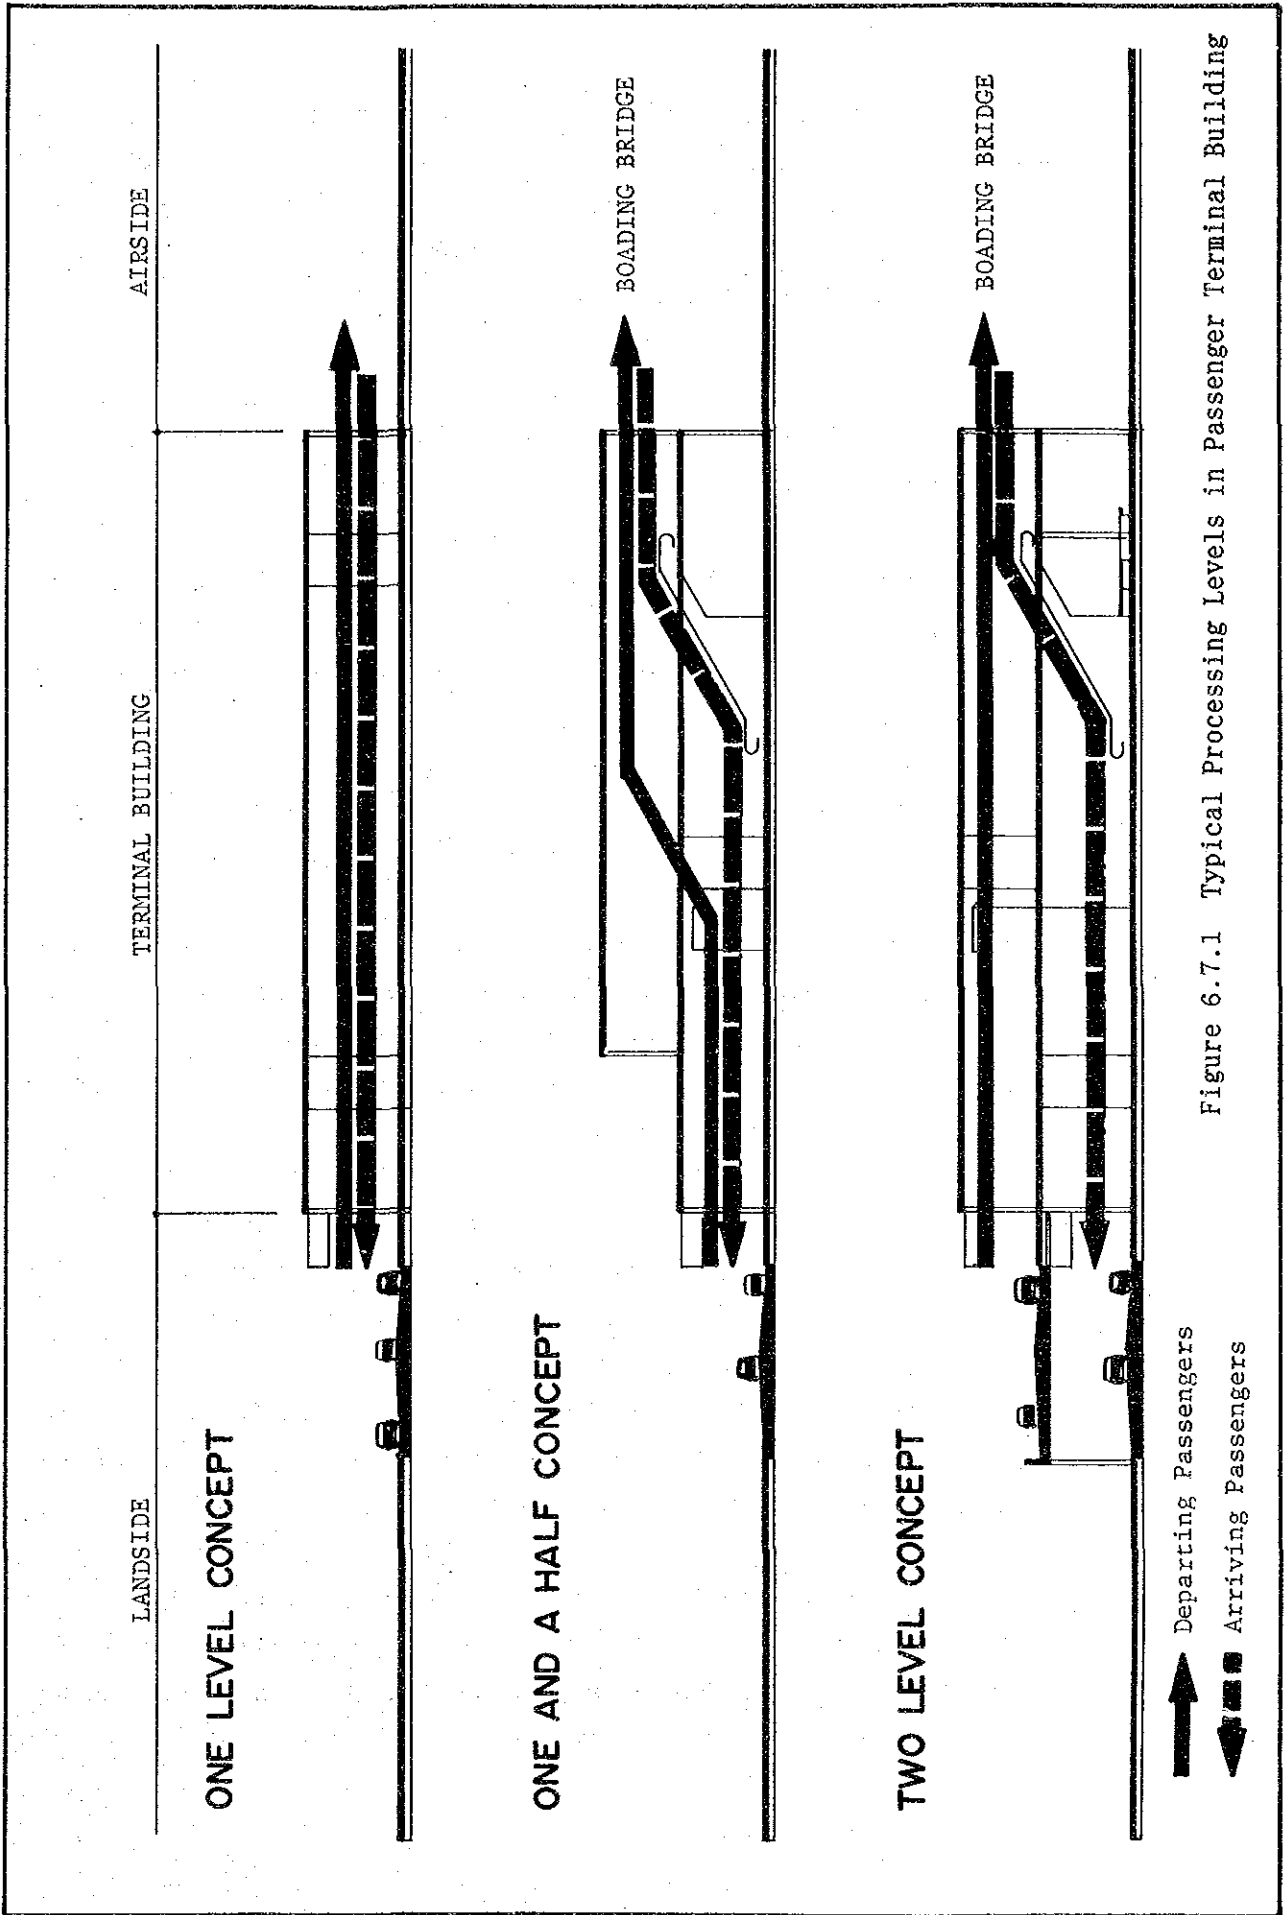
Typical Processing Levels in Passenger Terminal Building
